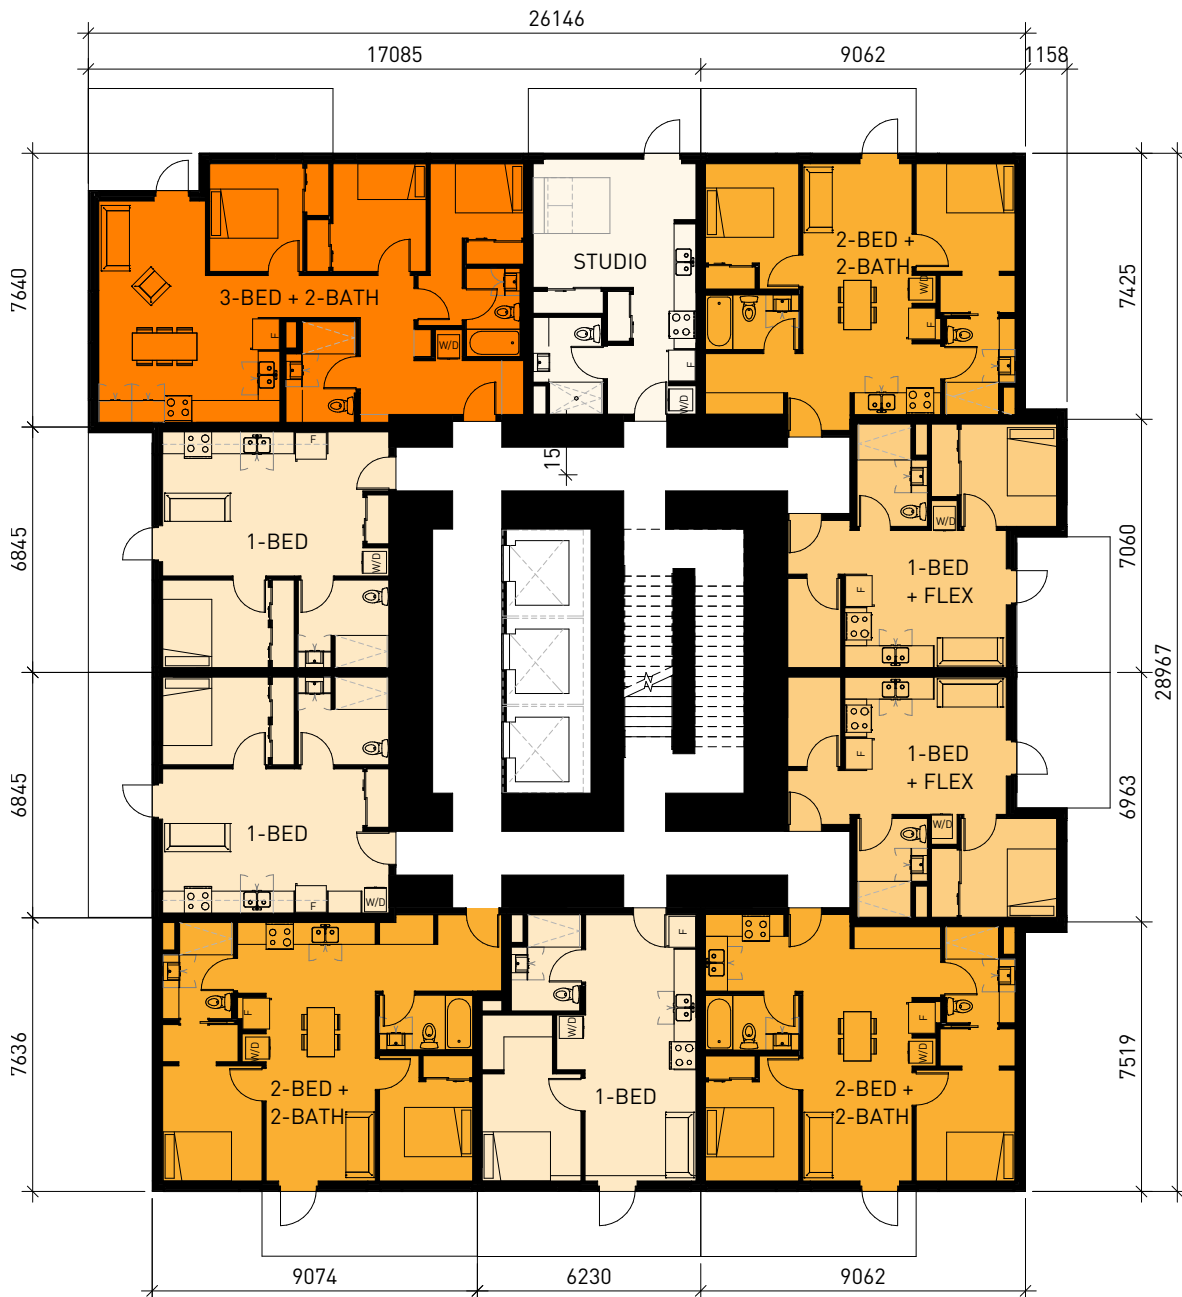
20 Storey Concrete Tower Floor Plate - Design Group 3, BCBC 2018
